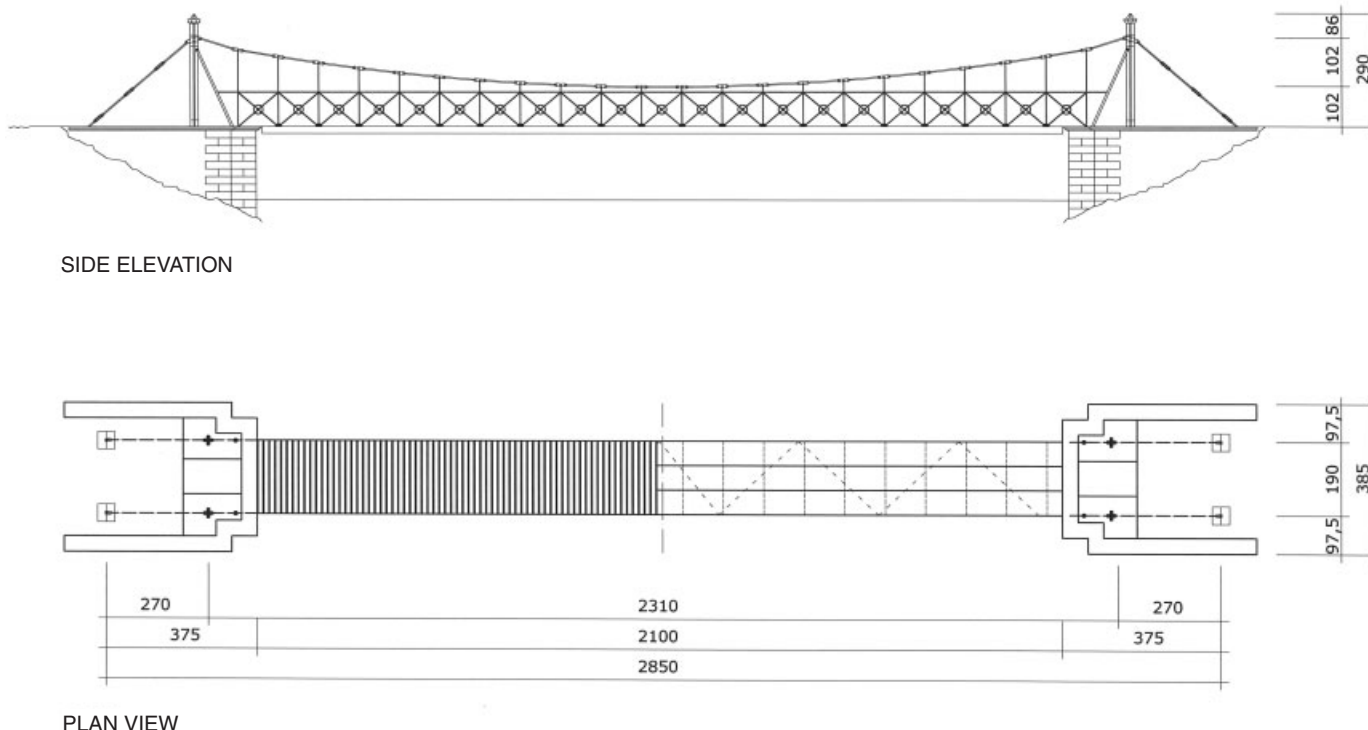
Side elevation and plan of the historic suspension bridge in its current state
